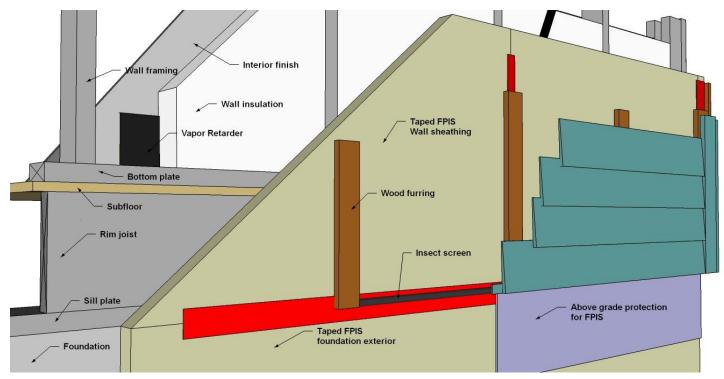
FPIS Extending Over Foundation with Protection Board Where Exposed Above Grade
